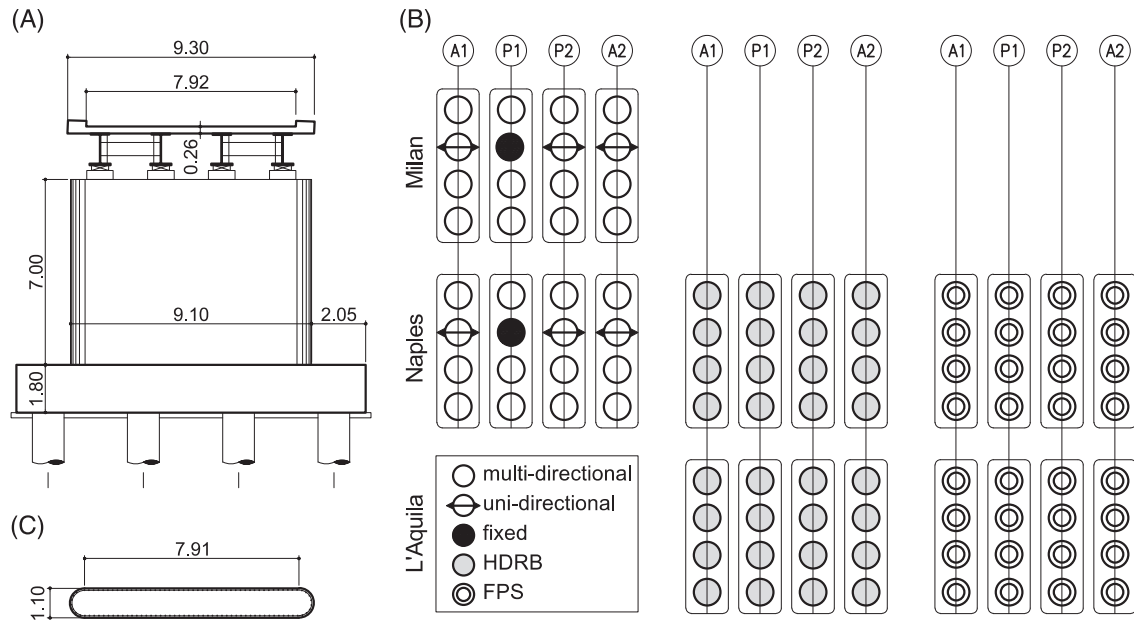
Traditional seat-type abutment overpass: deck cross-section (A), bearings layout (B) and pier cross-section (C).
